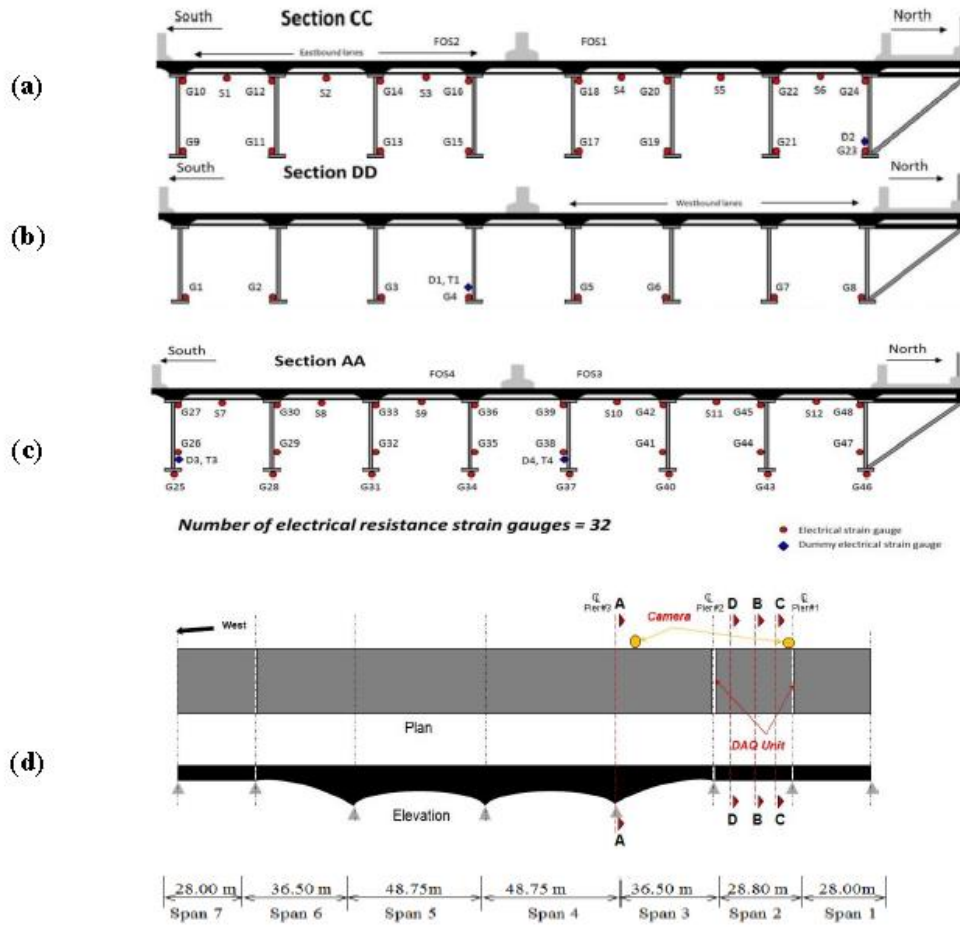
Winnipeg Bridge 1 (PBX): a) cross-section at Section CC, b) cross-section at Section DD, c) cross-section at Section at AA, and d) plan and elevation
